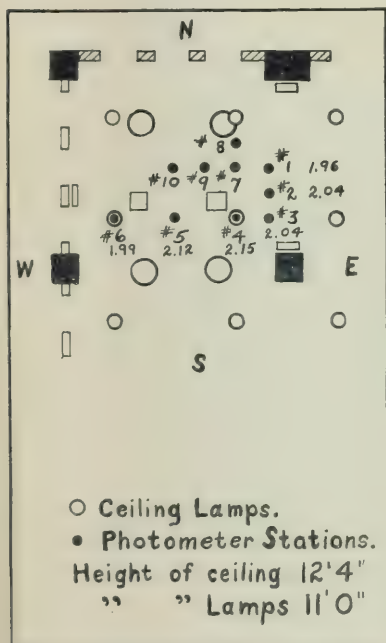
Section plan of eighth floor, (smoking room), showing location of furniture, pillars, lighting units, test stations and illumination data.
